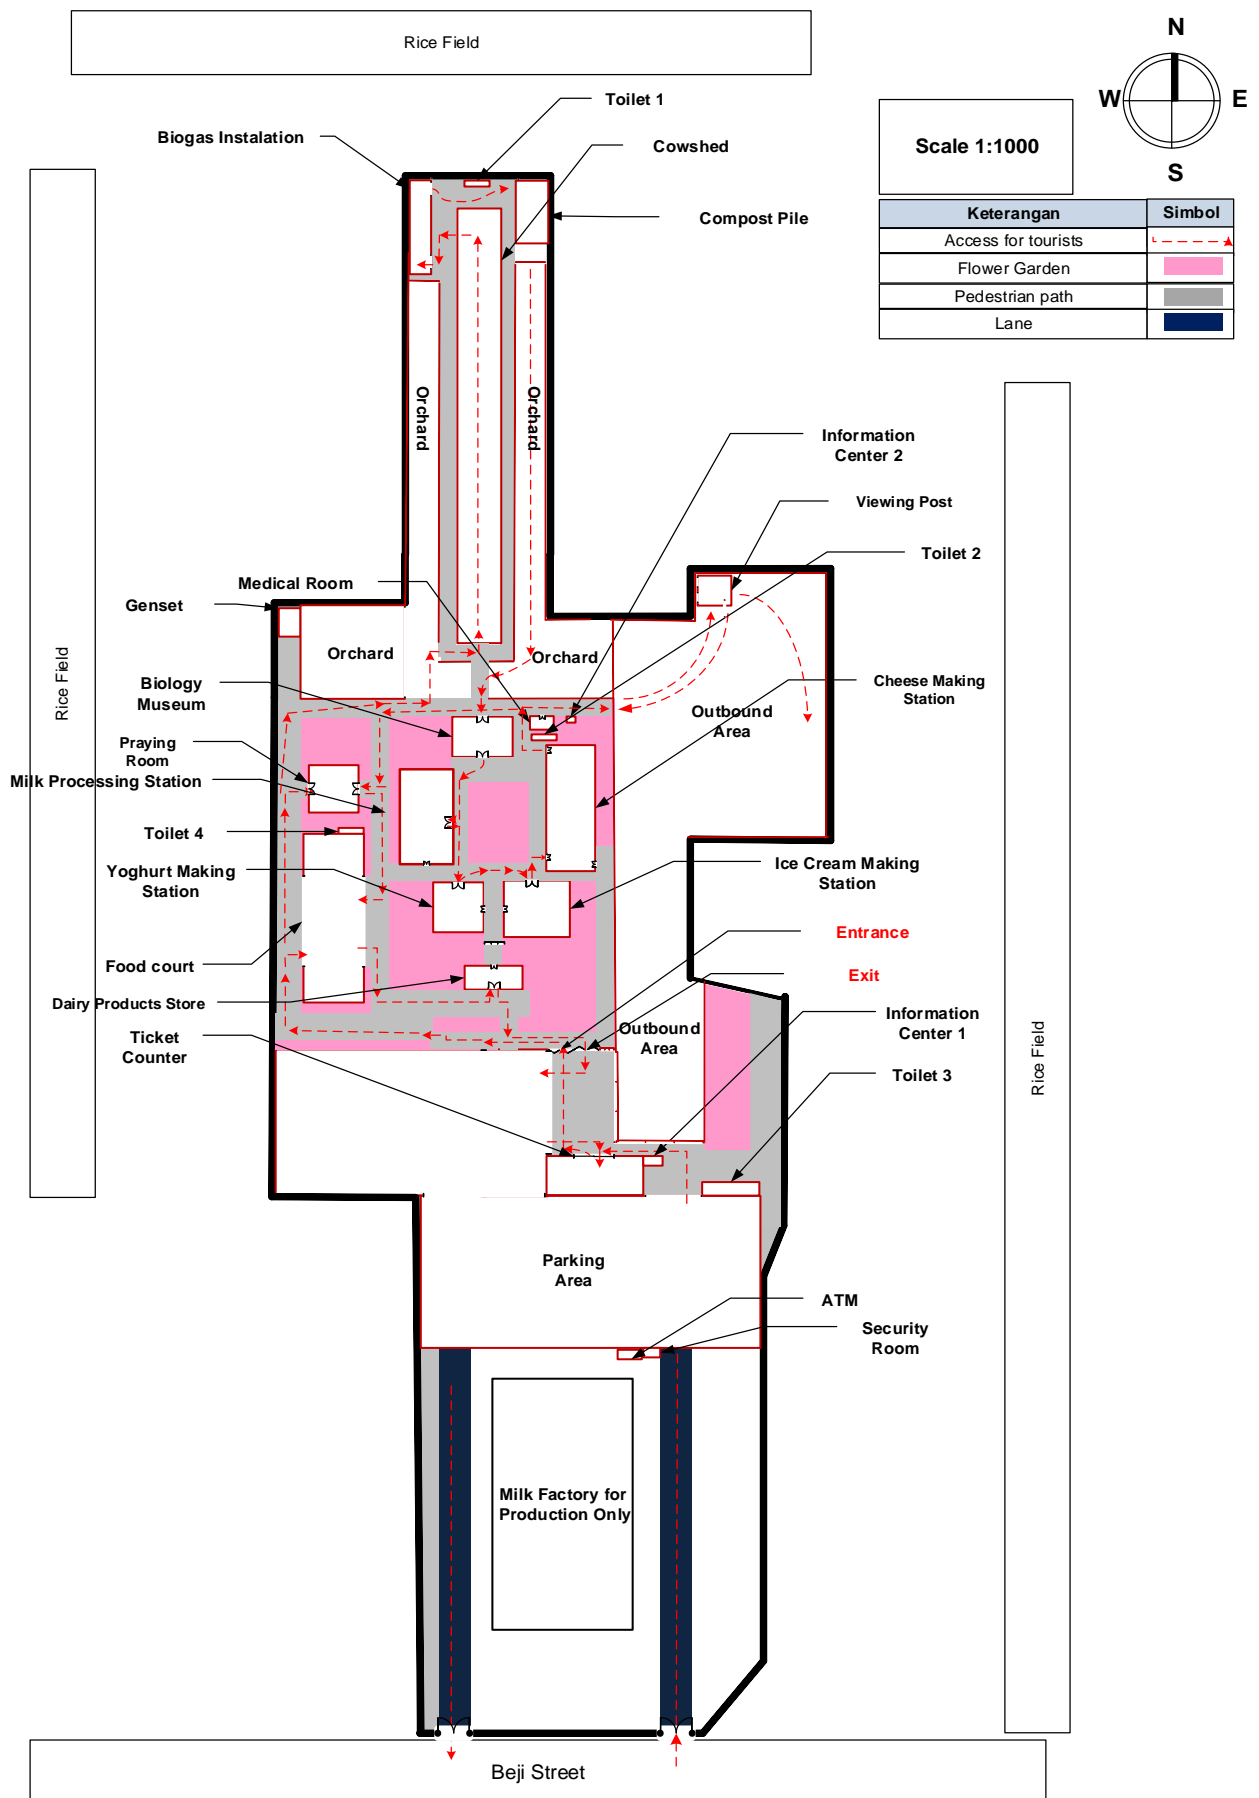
Layout plan of Dairy Farm and Dairy Plant based ecotourism
